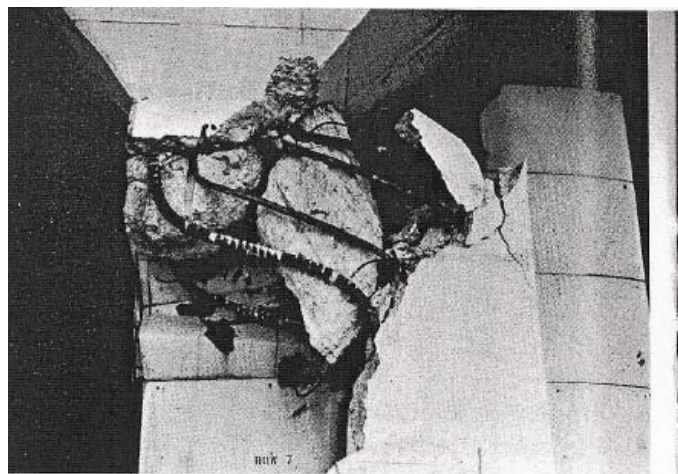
Large lateral deformations and failure of columns at sixth floor of Military Personnel Records Centre ([Beitel et al., 2002](#))
